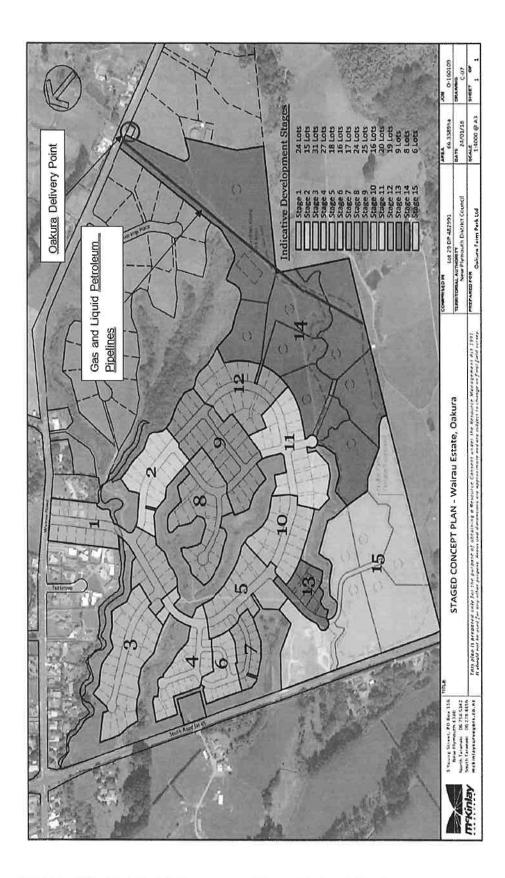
First Gas Assets (Imposed on Staged Concept Plan)
